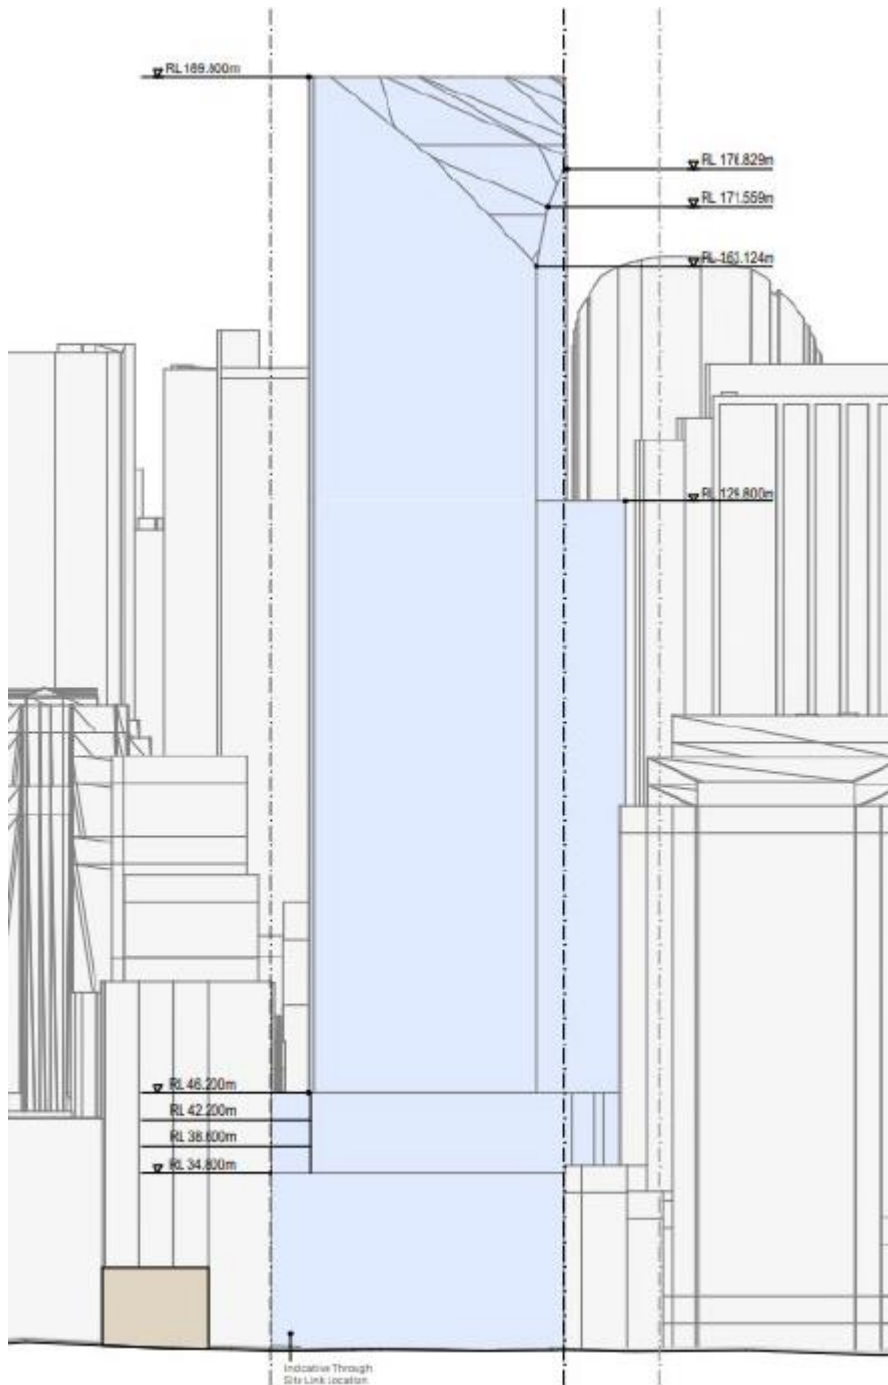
Proposed maximum building envelope - Sussex Street perspective
